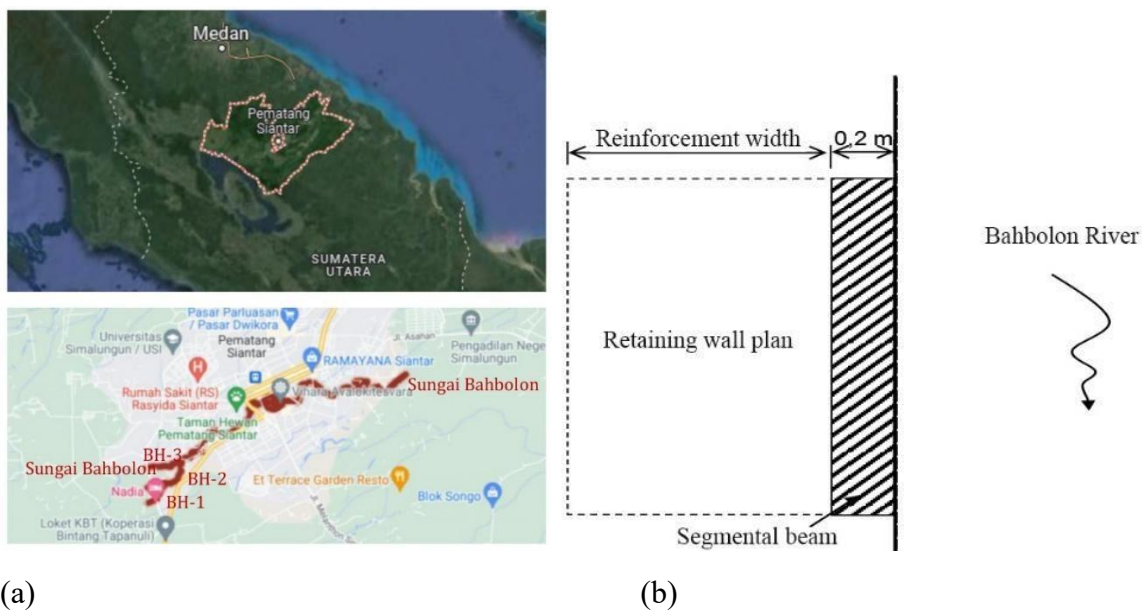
(a) Bahbolon river watershed (b) Retaining wall plan
